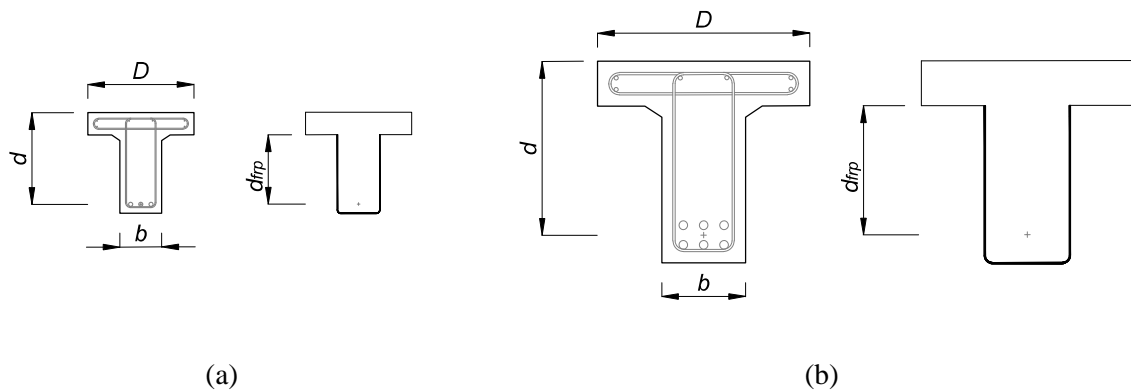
Slab-on-beam structures: (a) typical lab-scale specimen size, (b) real-life structure.
